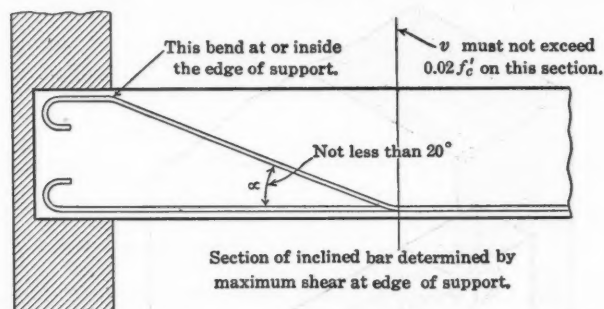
TYPICAL BEAM WITH WEB REINFORCED BY MEANS OF BARS BENT UP IN SINGLE PLANE.
